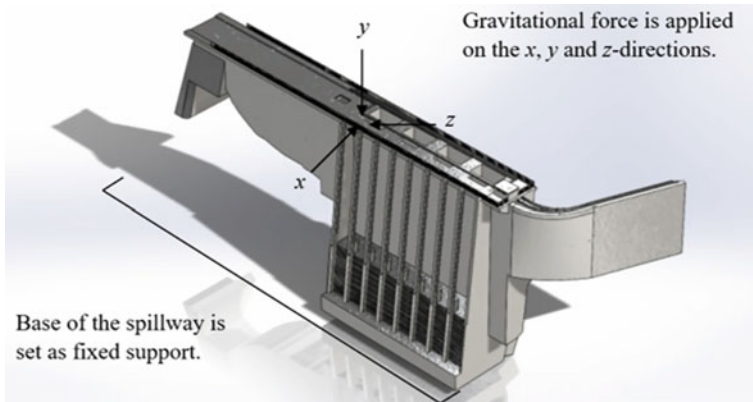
Real-scale 3D model and structural boundary condition of the intake section
